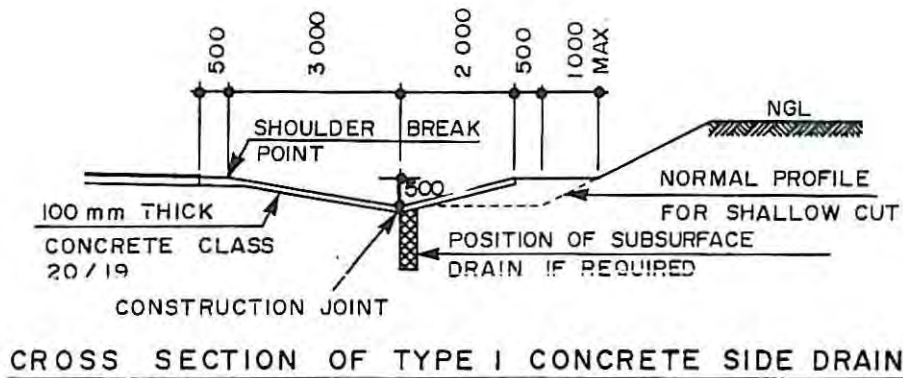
TYPICAL SIDE DRAIN SHAPES
